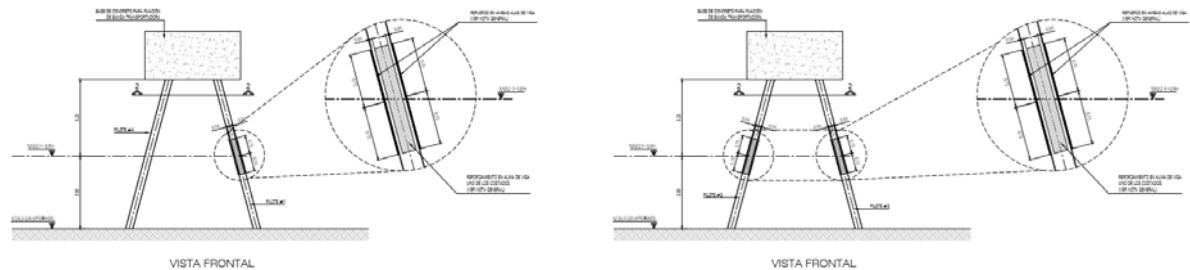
Example of the proposed pile reinforcement at Bent N.3.
